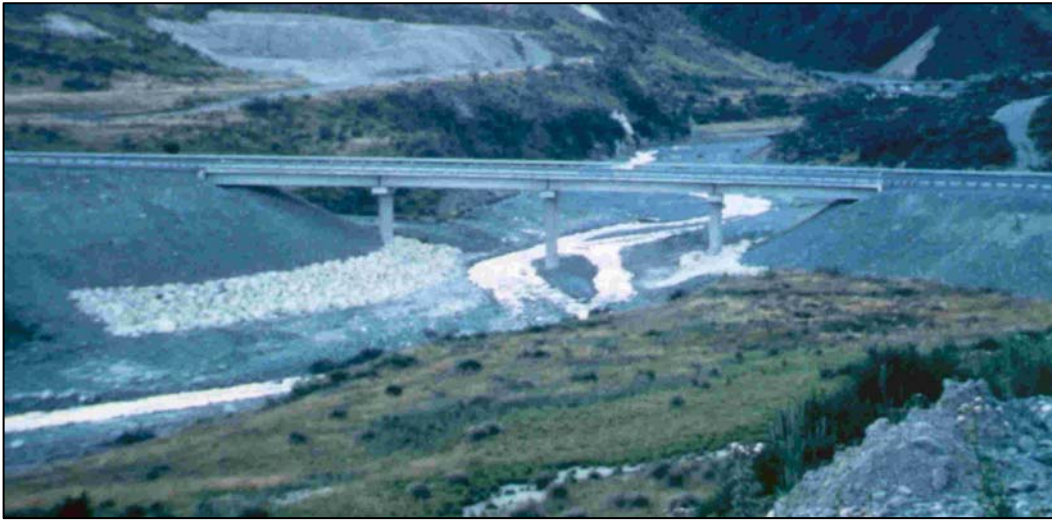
Riprap bank protection around pier and abutment; Waimakariri River, New Zealand
